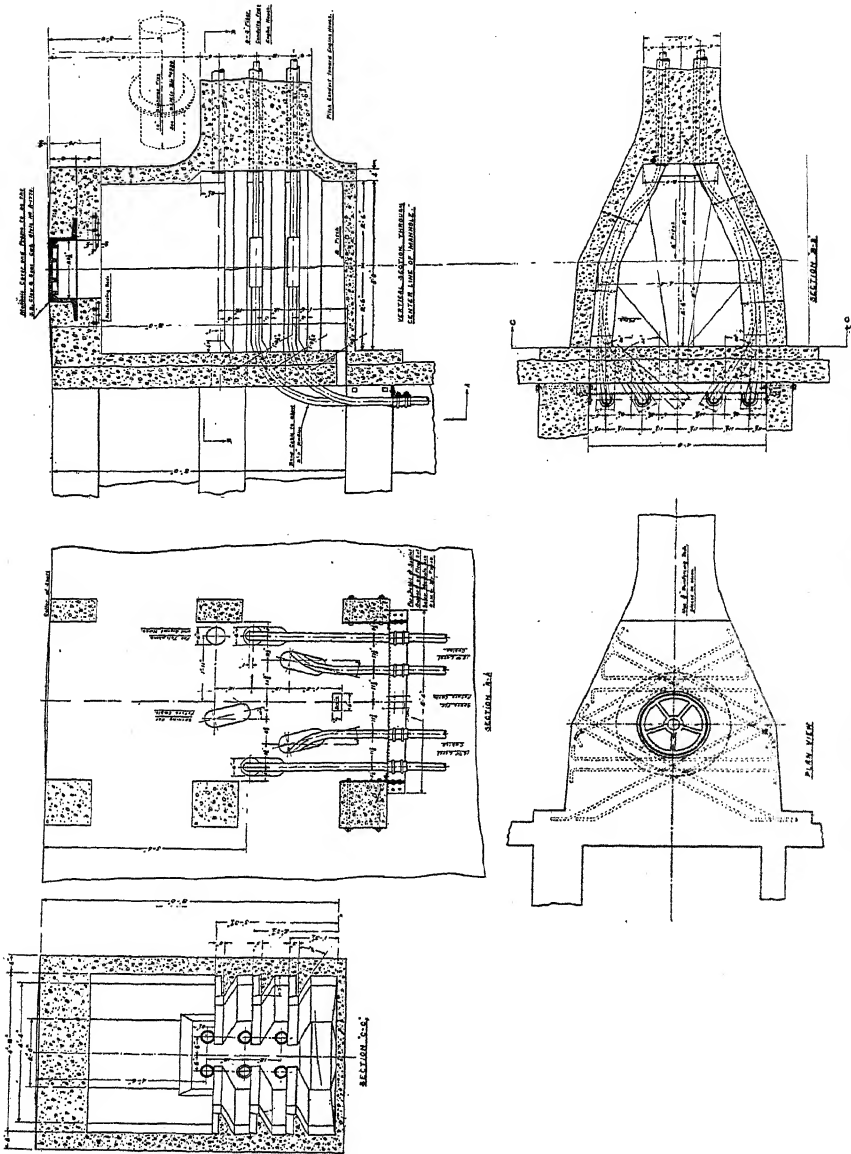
DETAILS OF CABLE MANHOLE FOR 2,300-VOLT CABLES.
